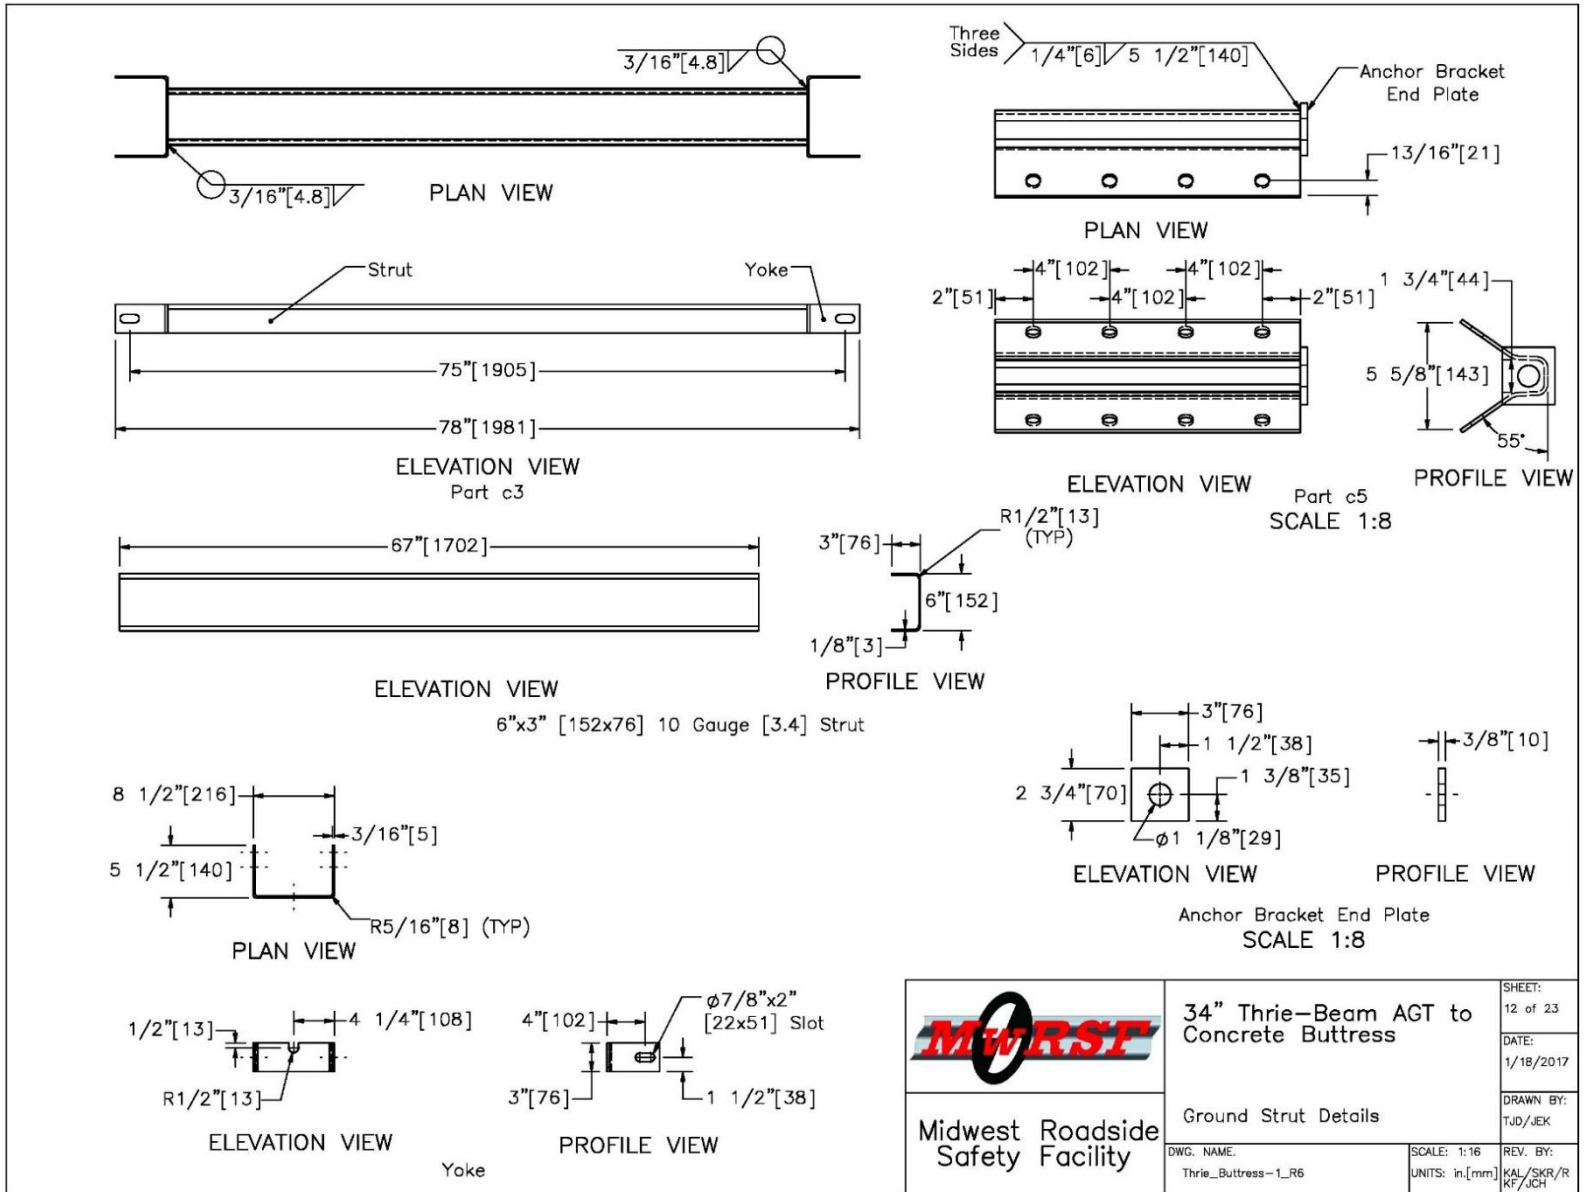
Ground Strut Details, Test Nos. 34AGT-1 and 34AGT-2
